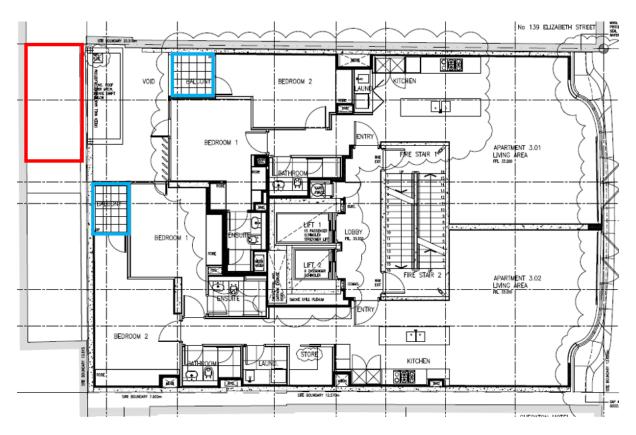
Floor plan of level three of 141-143 Elizabeth Street showing the rear outdoor terrace located on the first floor of the subject site in red (indicative only) and typical balcony locations in blue
